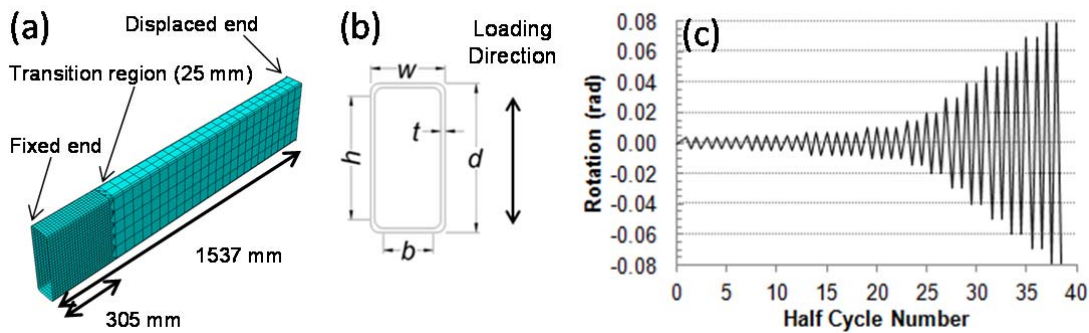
HSS finite element beam parametric study: (a) beam FEM, (b) cross-section dimensions, and (c) cyclic loading protocol.
